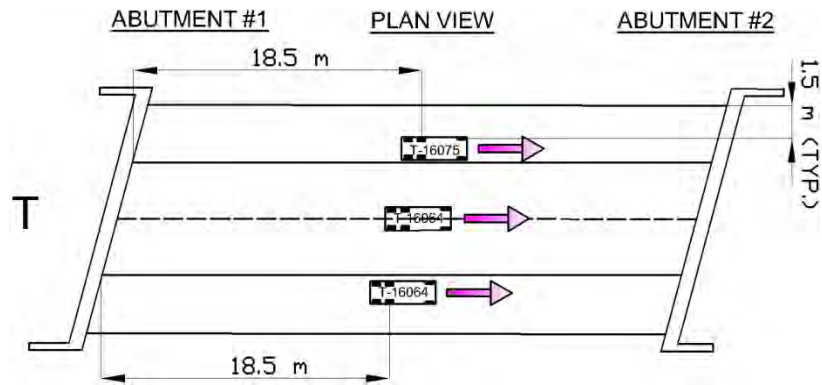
East Montpelier Load Testing Truck Locations (Transverse Arrangement)
